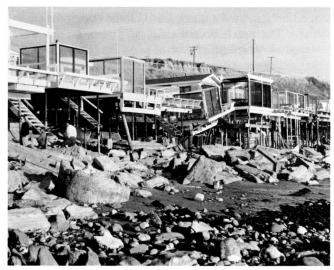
The trailer park at El Morro Beach suffered extensive damage to pipe pilings that support the trailer platforms. The entire cove area was stripped of sand.
